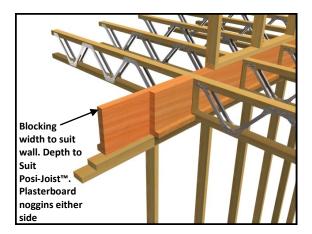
Butting Posi-Joists™ Perpendicular to Internal Load Bearing Wall
